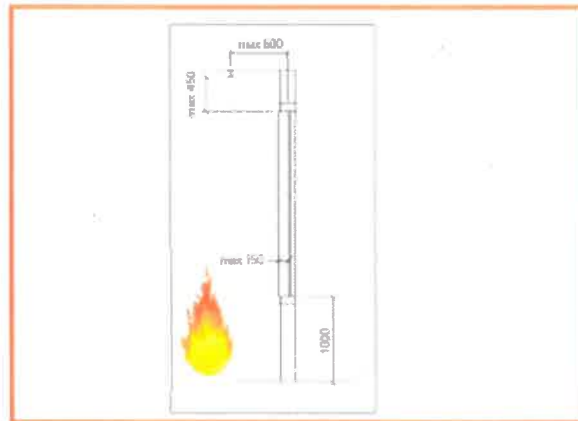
Excerpt from “Fire Protection of Windows Using Sprinklers”, showing limiting distances of ceiling mounted pendant type sprinklers to protect for an Internal Exposure
